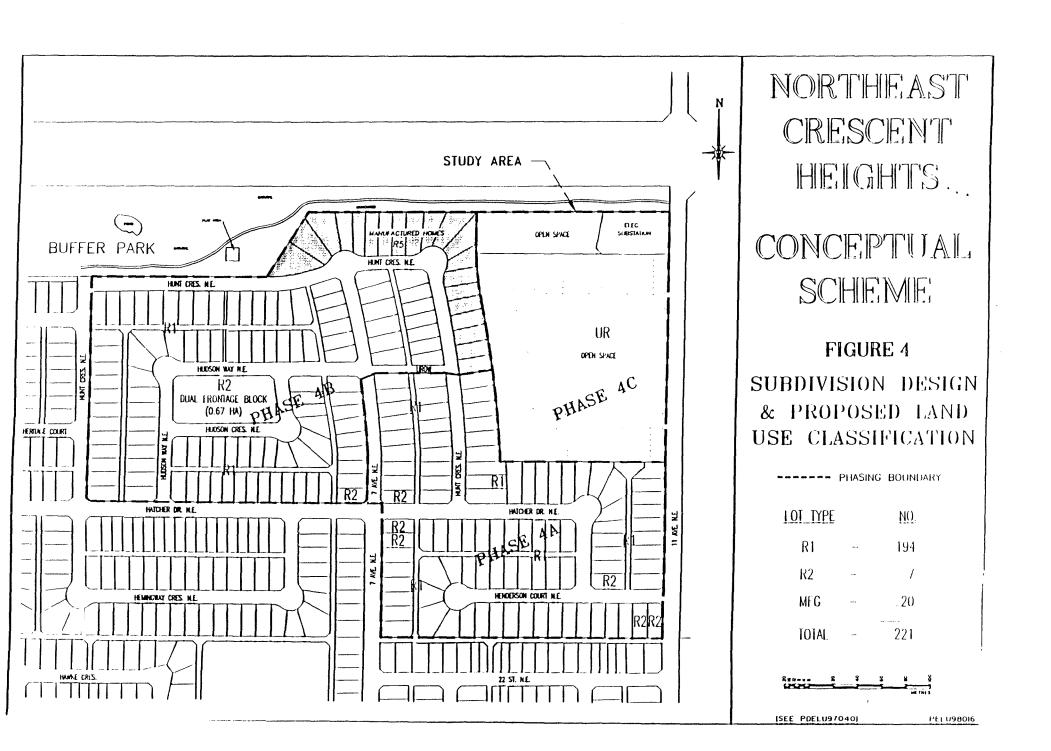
shows the subdivision design, staging and proposed land use classifications for the study area. The individual lots sizes will be determined at the time of subdivision based on survey plans reflecting market conditions. The site consists of approximate 220 lots which is of sufficient size to be developed in two sub phases (Phases 4-A & 4-B). At such time as all the wells in the study area are abandoned, a third development sub phase (Phase 4-C) is possible, however, since this could be 15 to 20 years in the future, this situation need to be carefully reviewed at that time. Based on the fact that the sanitary and storm water services will flow to a low area near the southeast corner of the site, it is logical to start development in the southeast and progress in a northwesterly direction.
